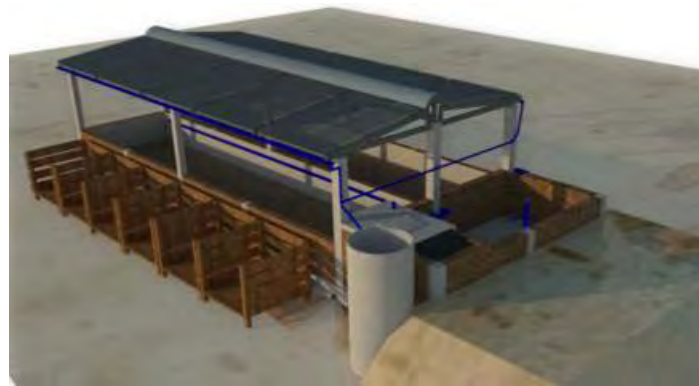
An overall schematic of the treatment plant site, showing the compost bins, roofed SDBs, rainwater collection, sludge inlet screen, aerobic pond, and raised earth hill for discharge
